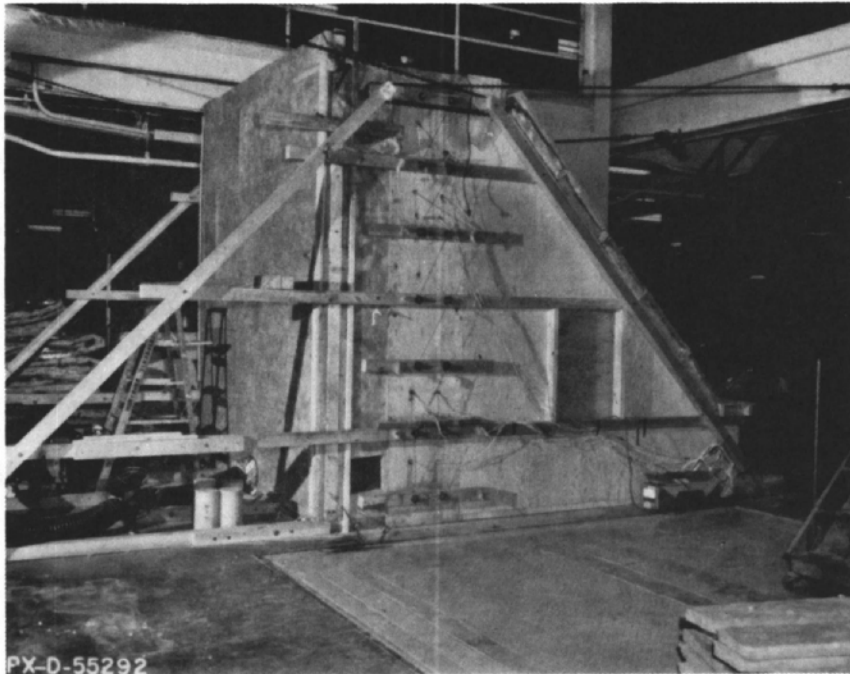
General view of the chambers surrounding the wall. Photo PX-D-55292
